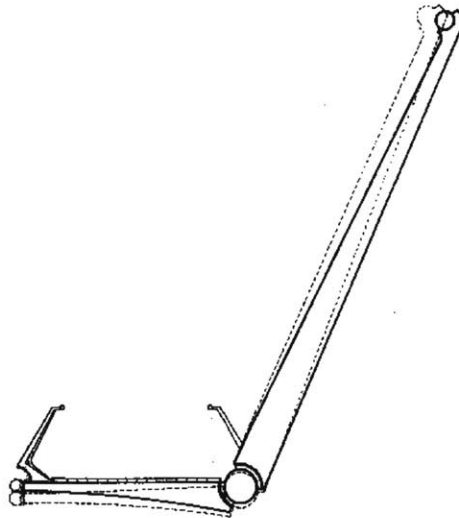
Global rotation of the La Devesa Footbridge with walkway loads
